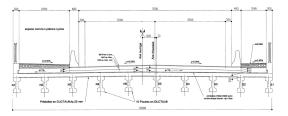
Cross-section of the Saint Pierre La Cour Bridge [Fehling et al., 2008]
